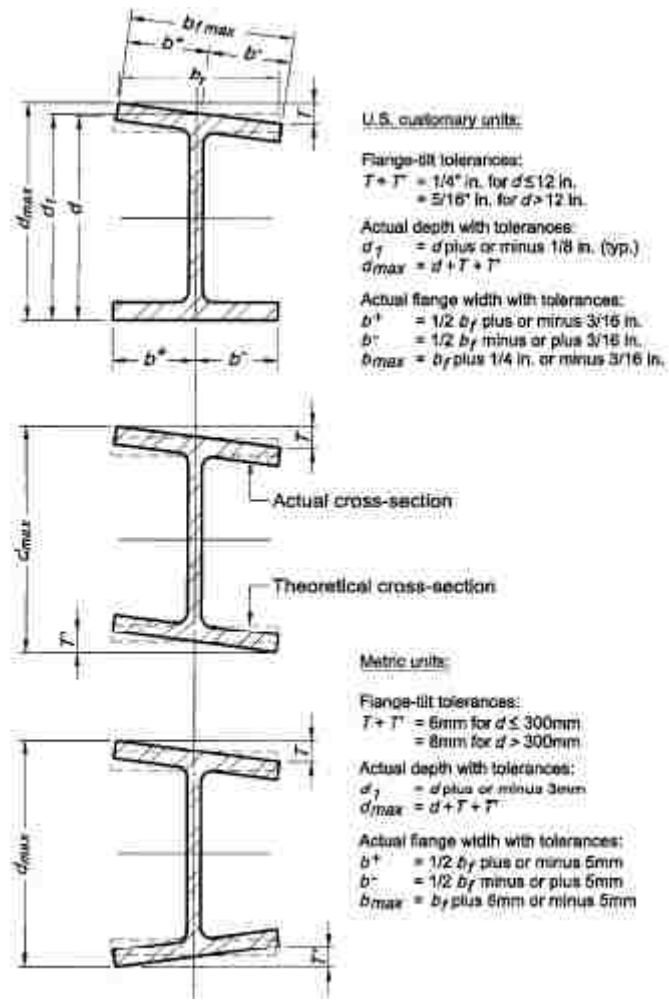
19. Mill tolerances for beam flanges.
